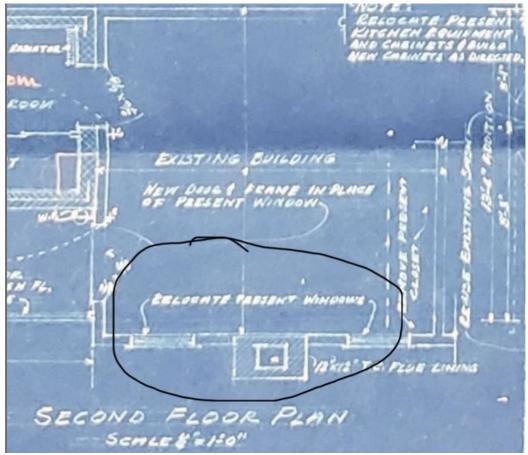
1951 drawings showing the relocation of the subject windows from the western exterior wall
